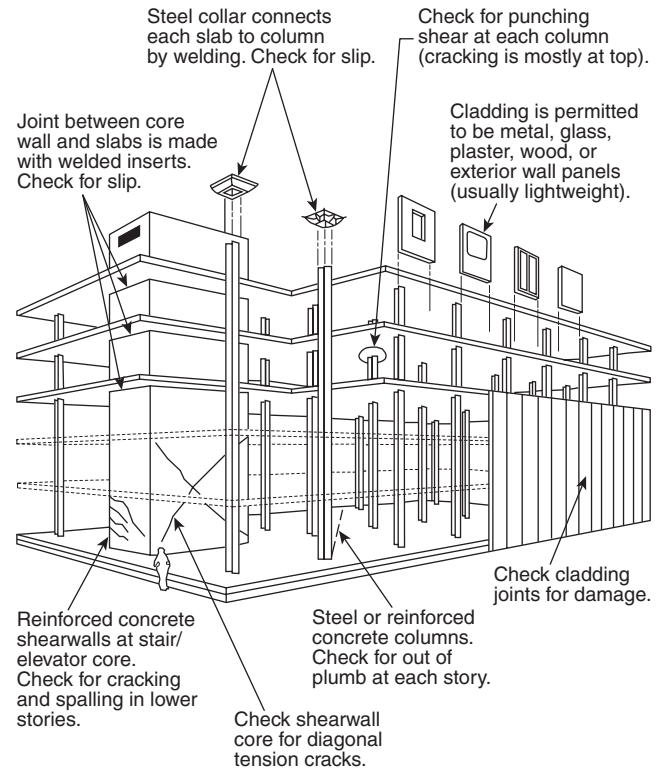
(b) Post-Tensioned Lift Slab Building.
